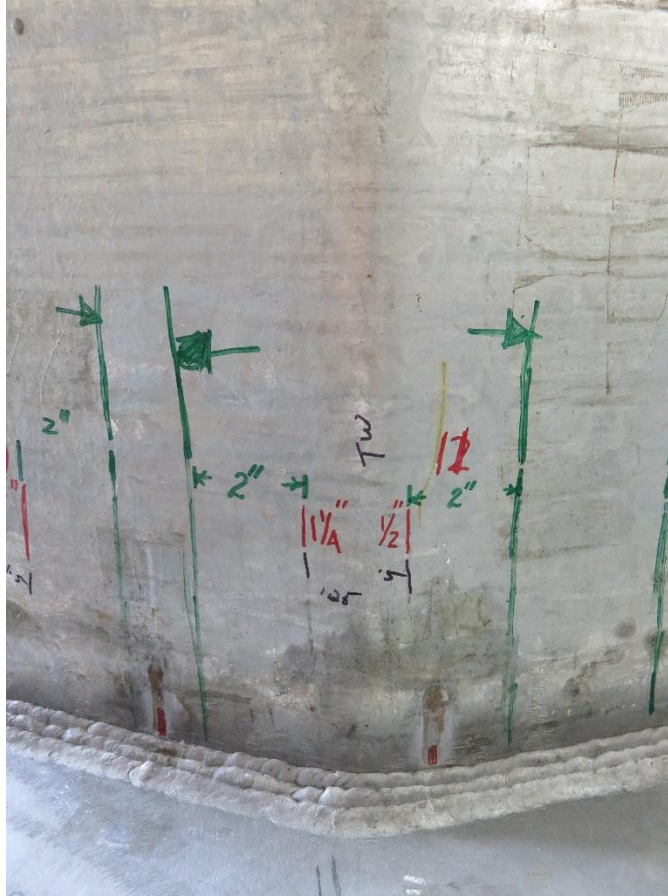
Specimen 33-3-12-TX-A3 (Bend 11) following the Fatigue Test 6 at the Stress Range of 2 ksi (Fatigue Cracks after 66.2 Million Cycles)
